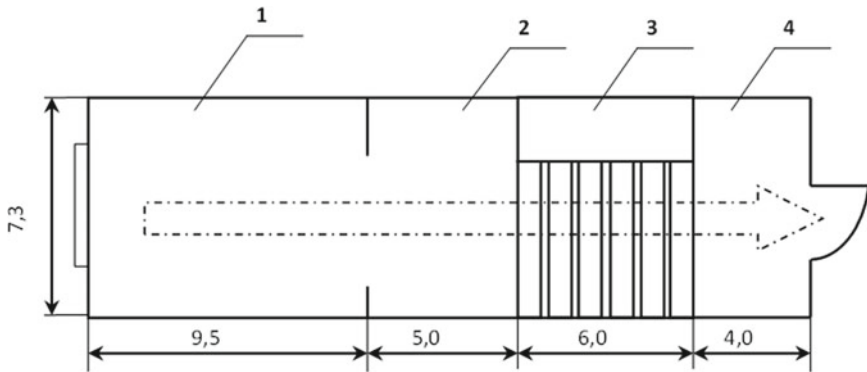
Calculation scheme: Sects. 1, 2, 4—horizontal path; 3—stairs down, ramp
